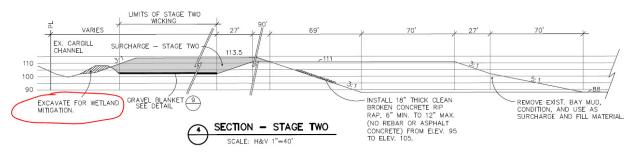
Excerpt of Cross Section from Site Preparation Plan³⁵⁵
